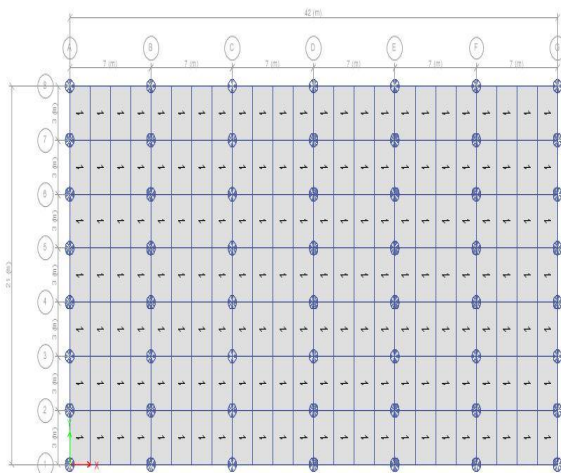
Plan of rectangular column with monotonic and Cyclic loading
